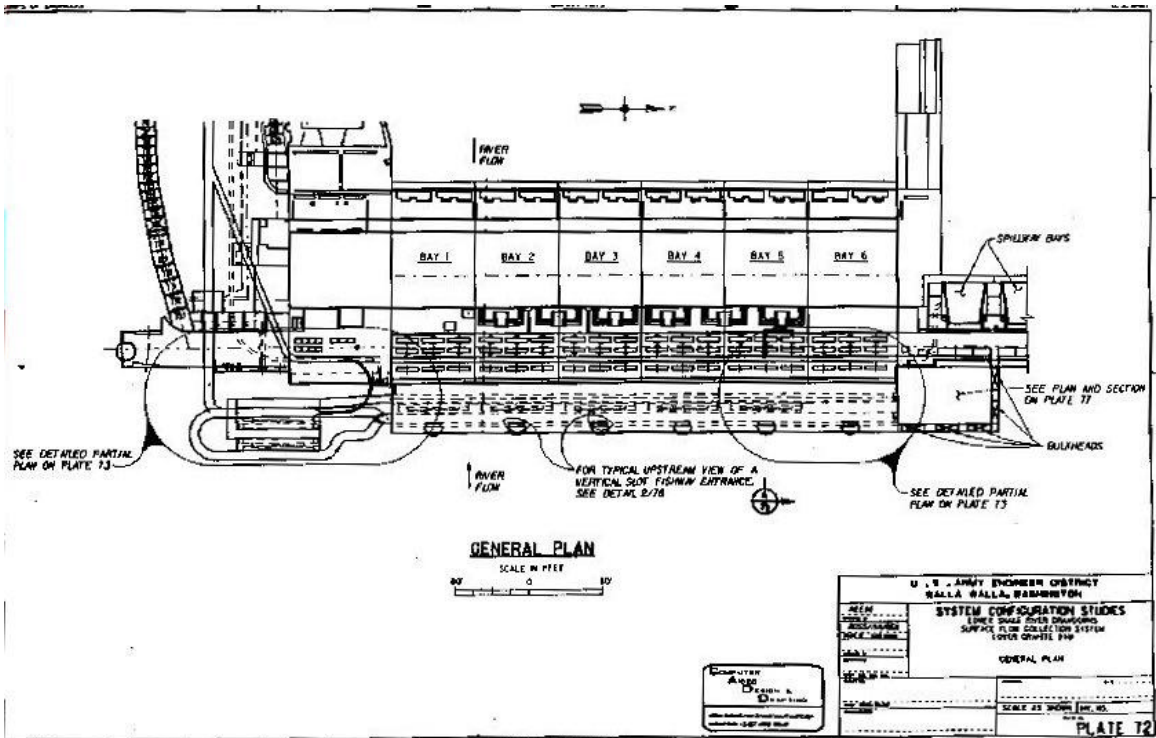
Vertical Slot Fishway Entrance Concept--General Plan
